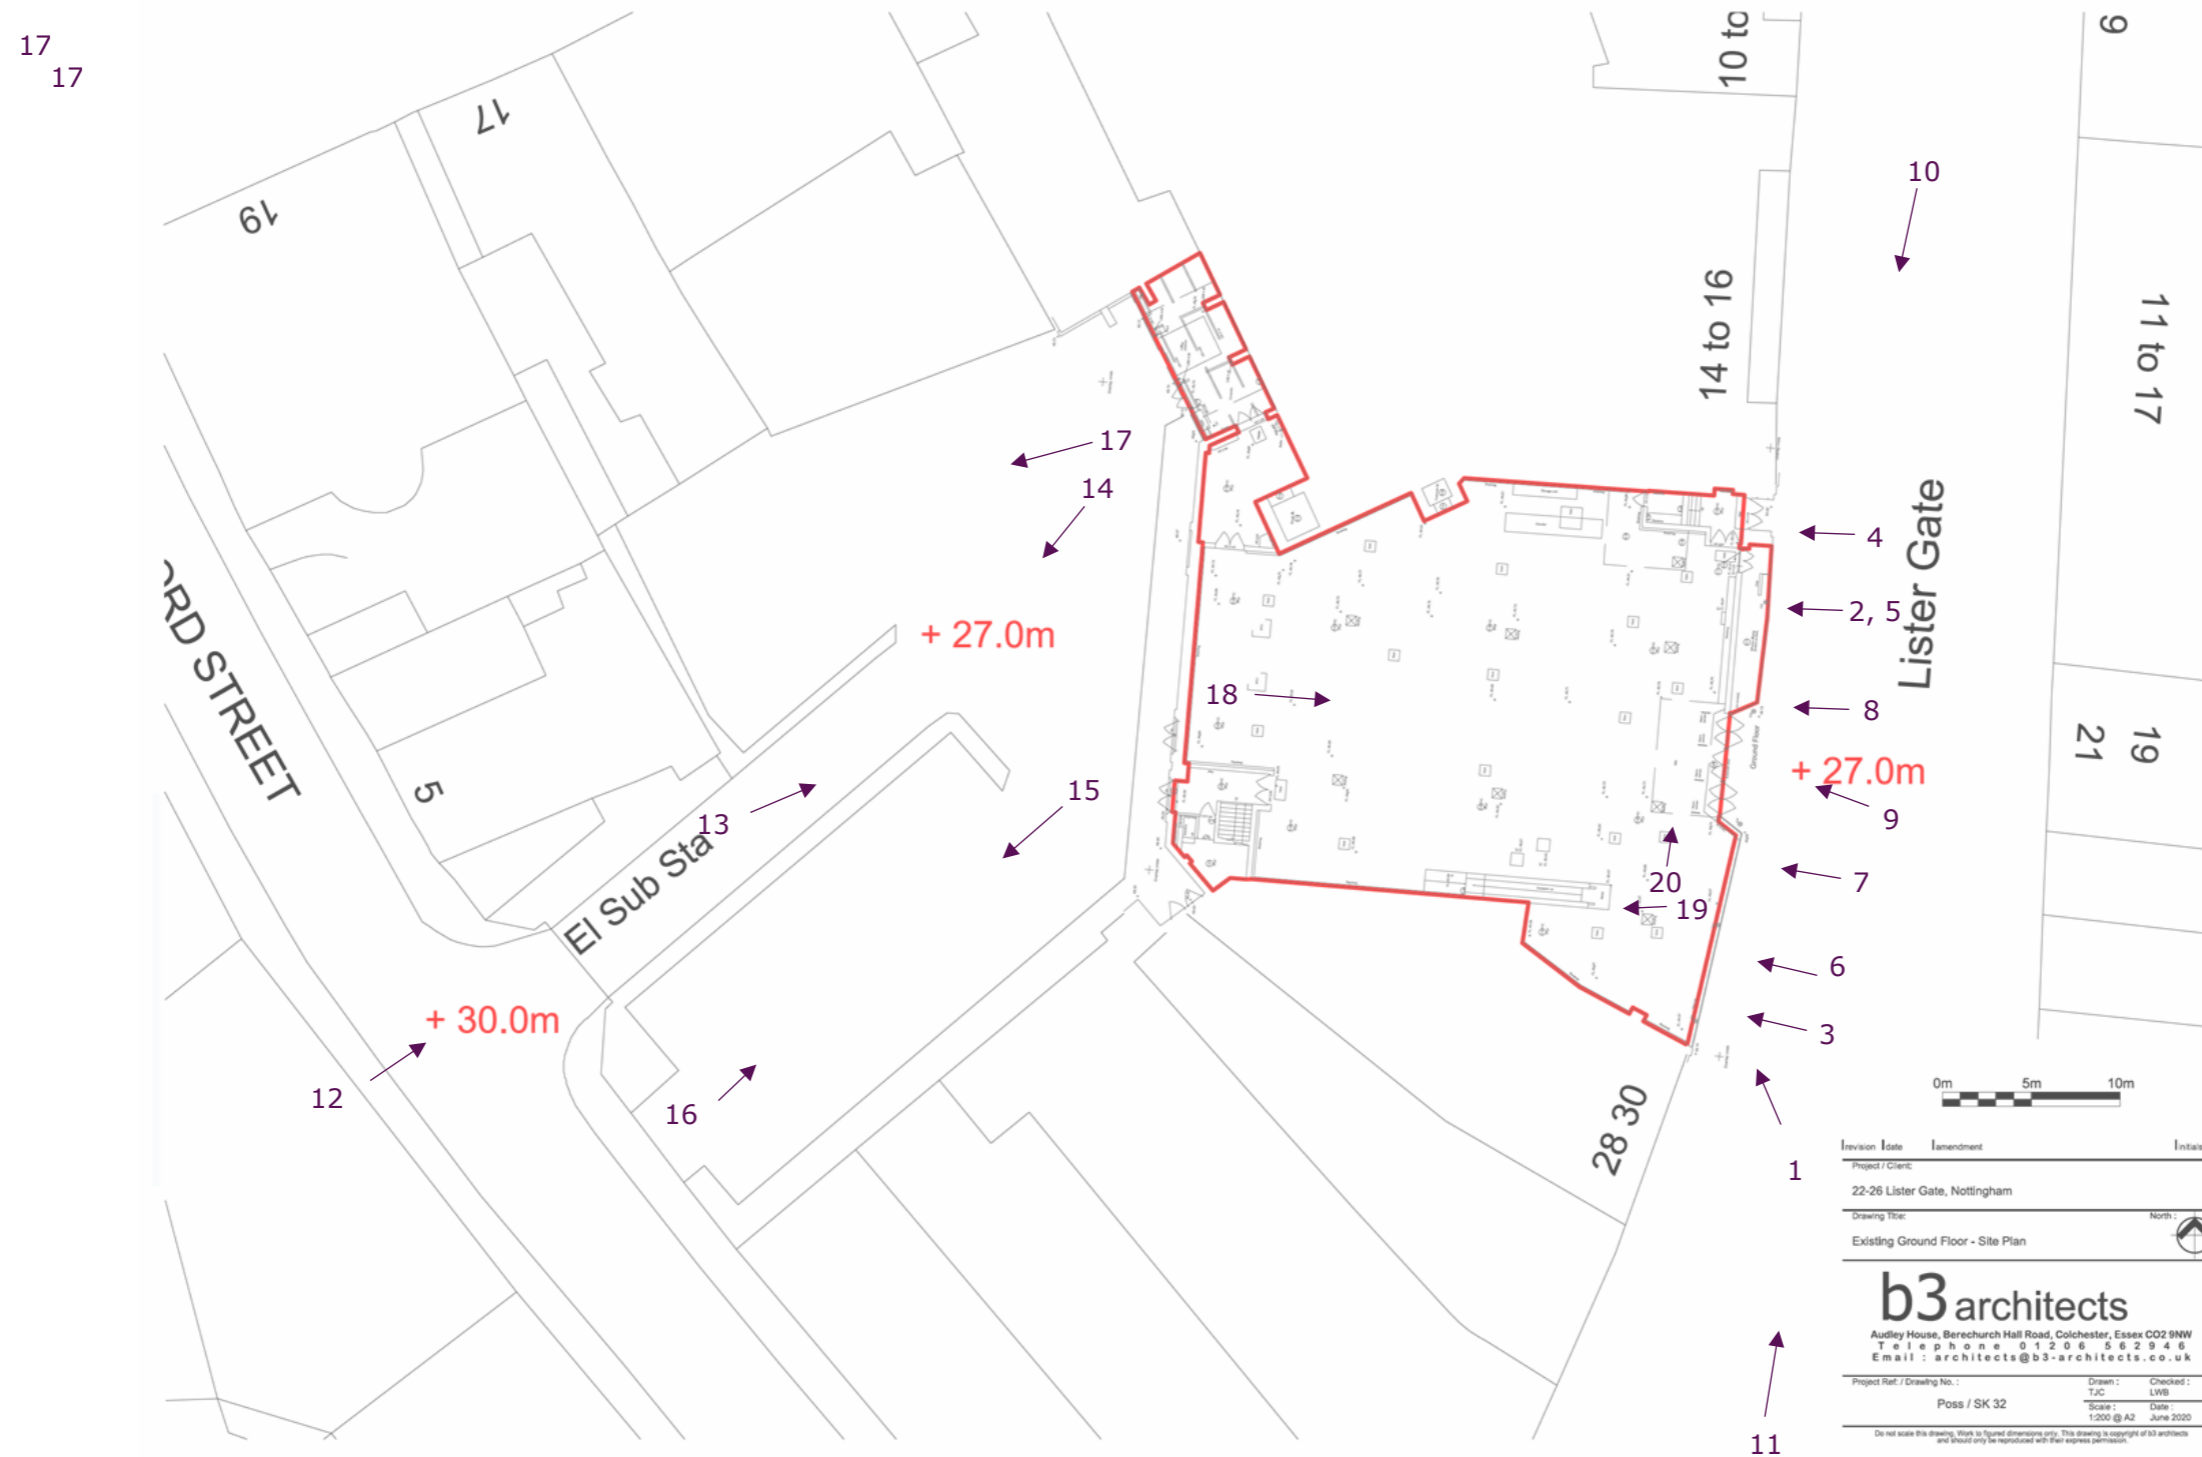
Ground floor plan (by B3 Architects, provided by client) showing locations of external photographs and those on the ground floor
